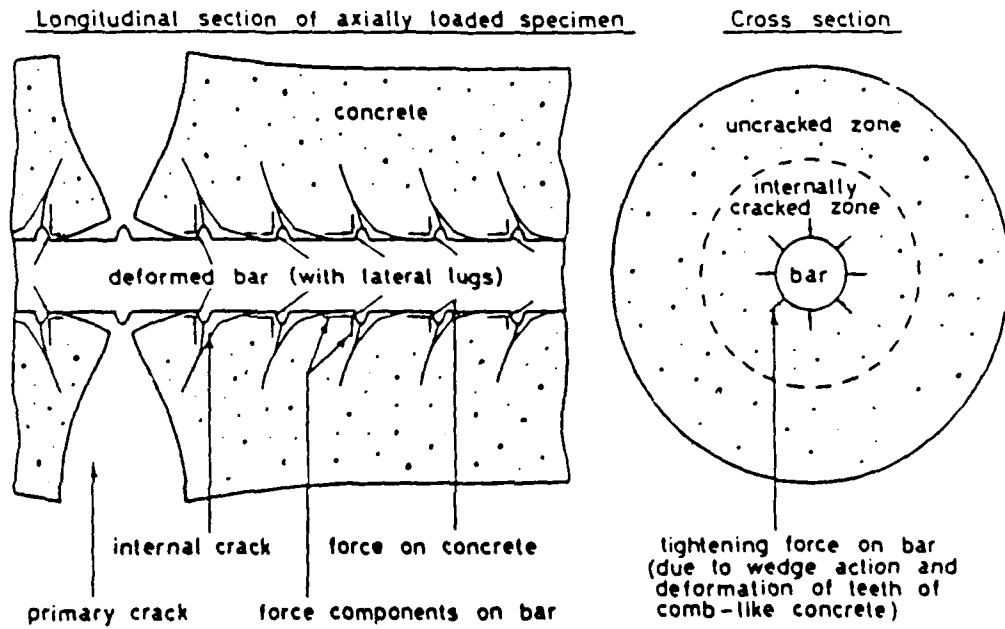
Internal bond cracks and forces acting on concrete (From Ref. 18).
